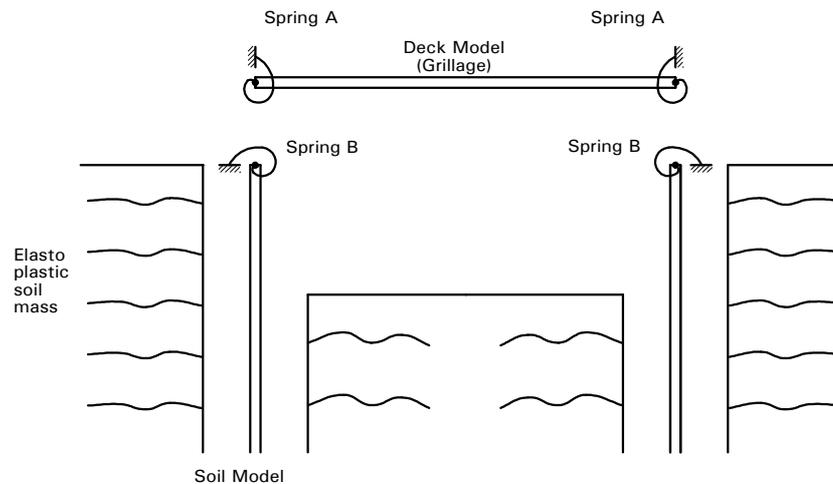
Idealisation of integral bridge when using separate deck and wall models
